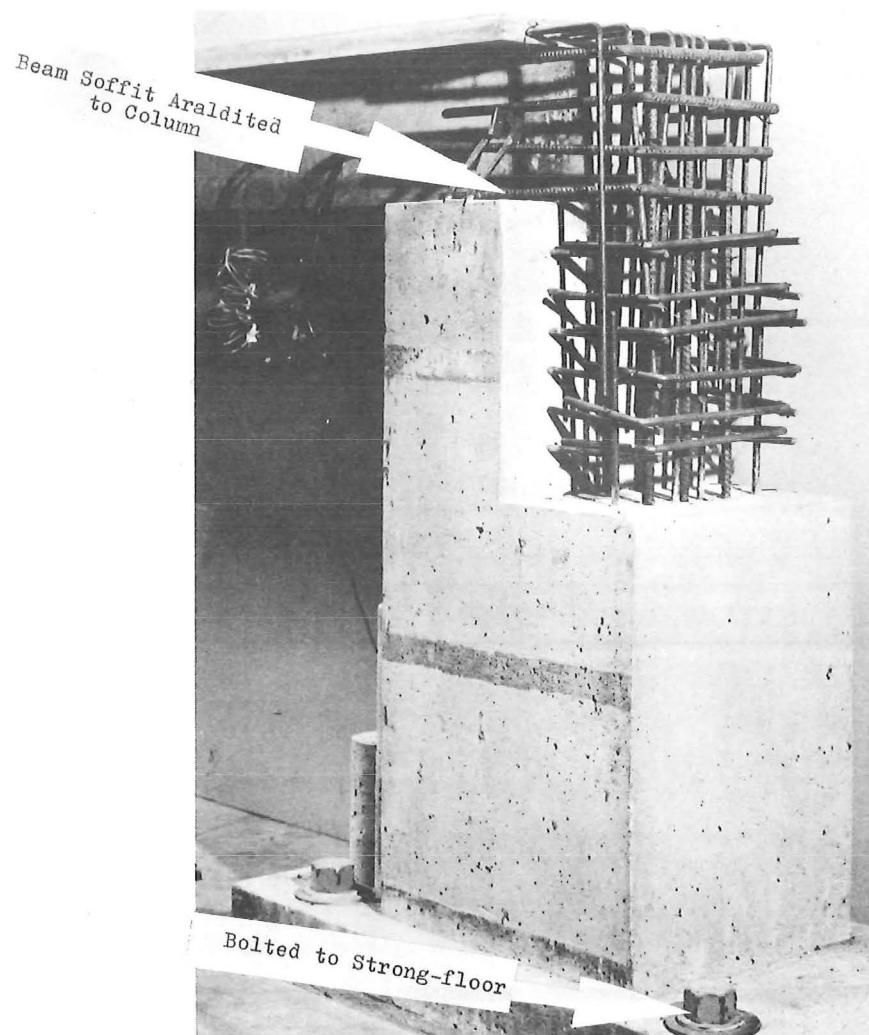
BEAM TWO - END COLUMN REINFORCING DETAILS
